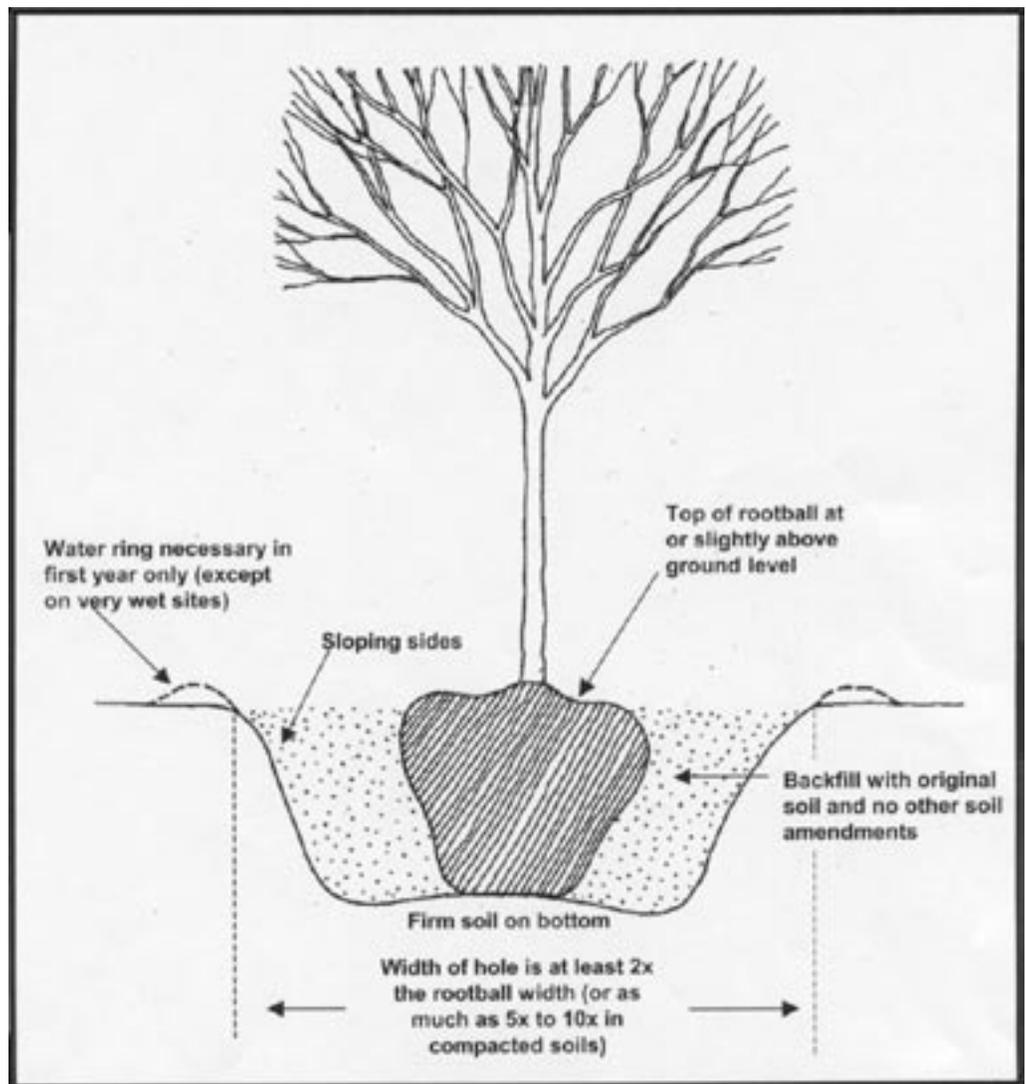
Prepare a broad planting area, plant tree with the root flare at ground level, and provide a watering ring to retain water (from Head and others 2001).
